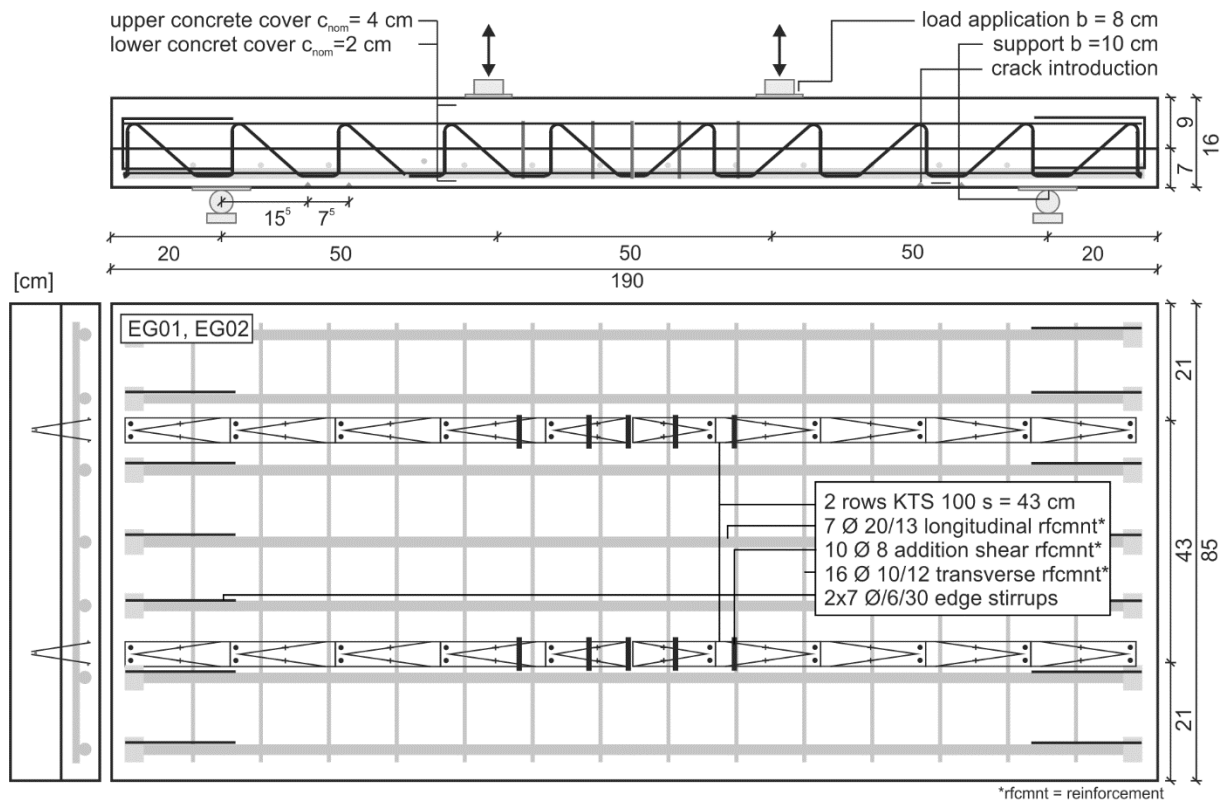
Reinforcement and formwork detail of specimens EG01 and EG02
